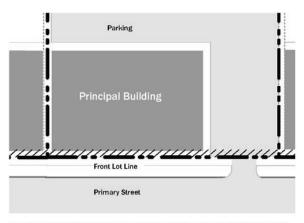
G (3). Primary Street Frontage Only: Access Drive Permitted Location
